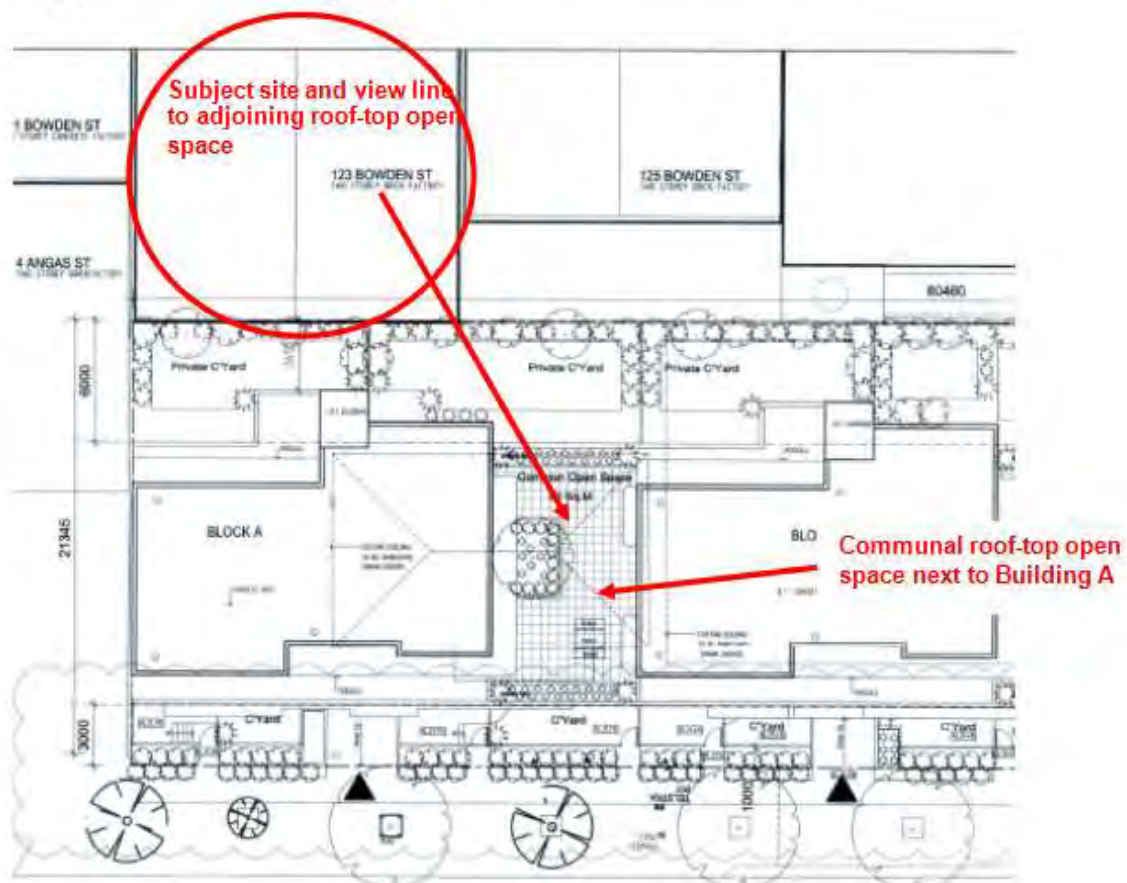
Partial approved site plan for LDA2011/0376 4 to 8 Angas Street Meadowbank
